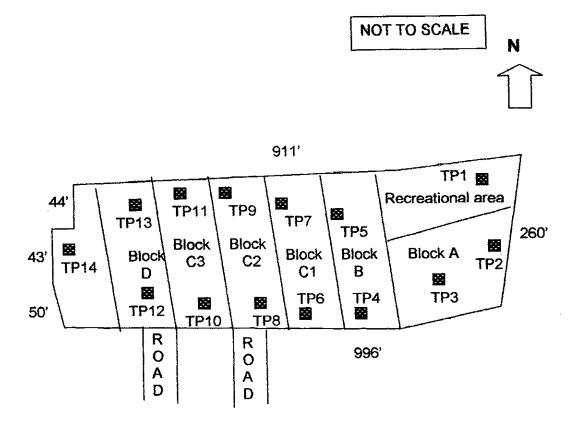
Layout Plan for Residential Buildings at Nagaram, Keesara (M), showing locations of trial pits.
